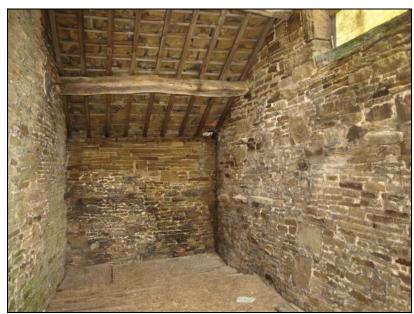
First floor hay loft in north-east end of farmhouse (former shop?)
